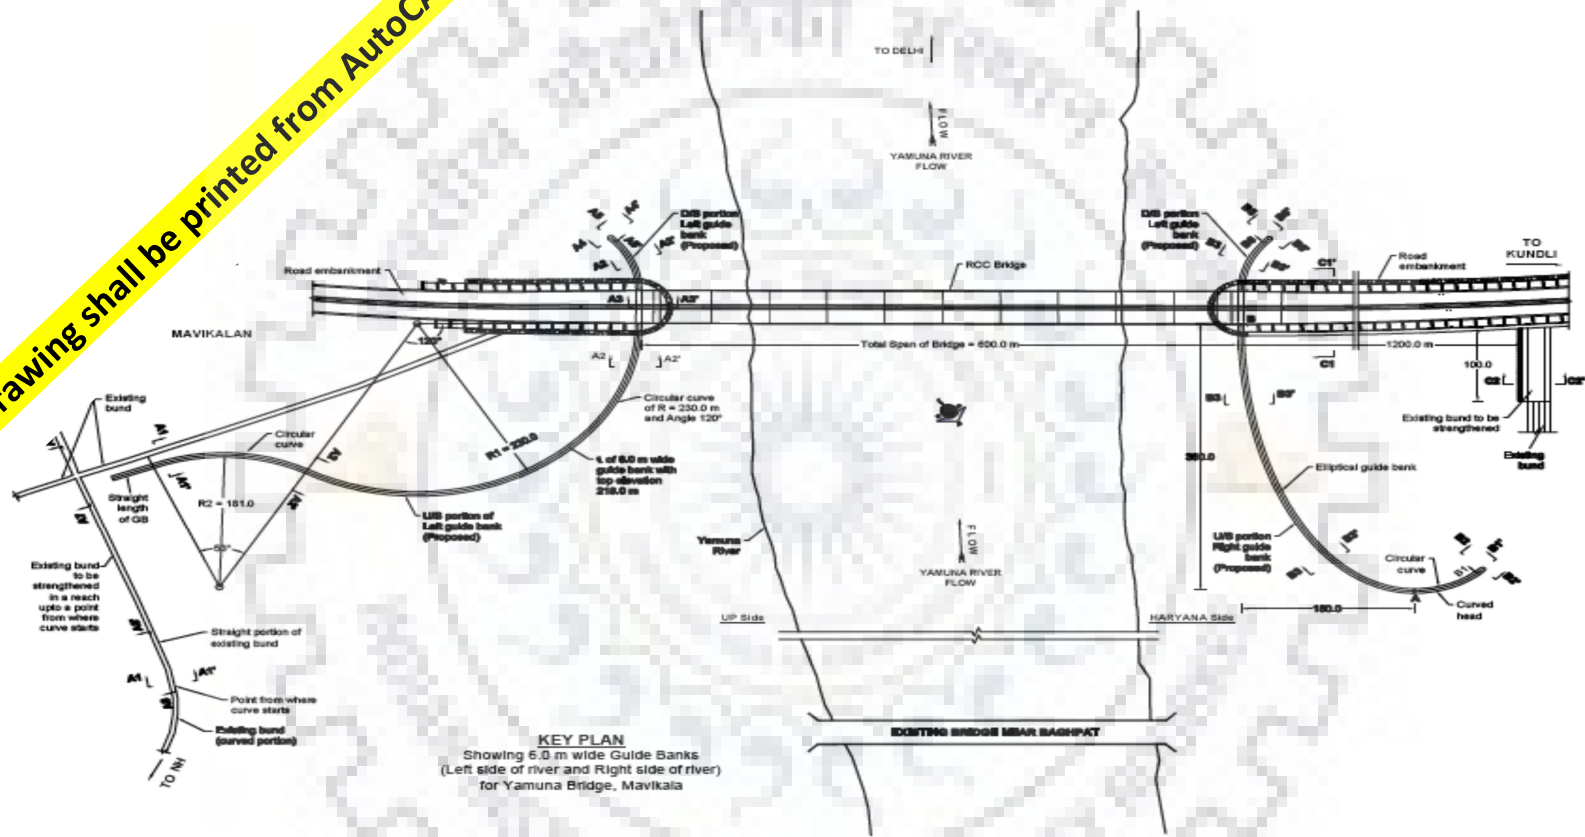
Key Plan of the proposed Guide Bank System for Bridge 1
